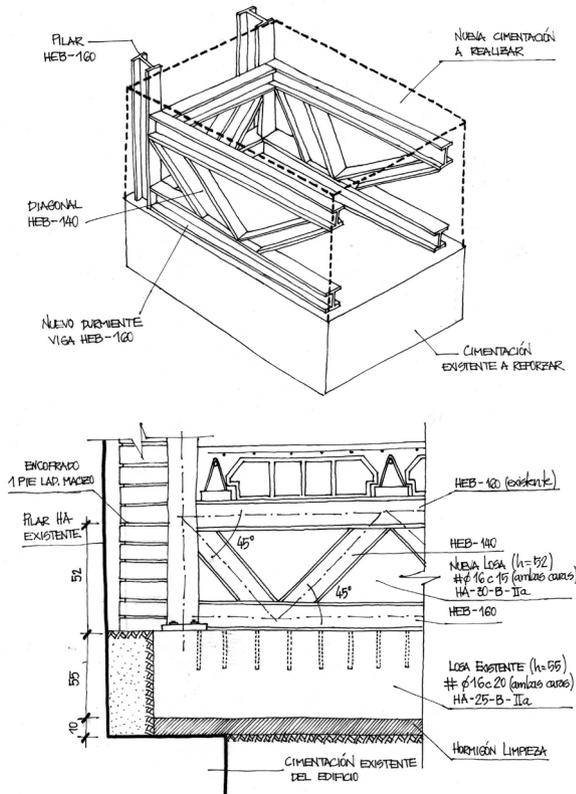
Construction detail of structural reinforcement (graphic elaboration by the authors).
